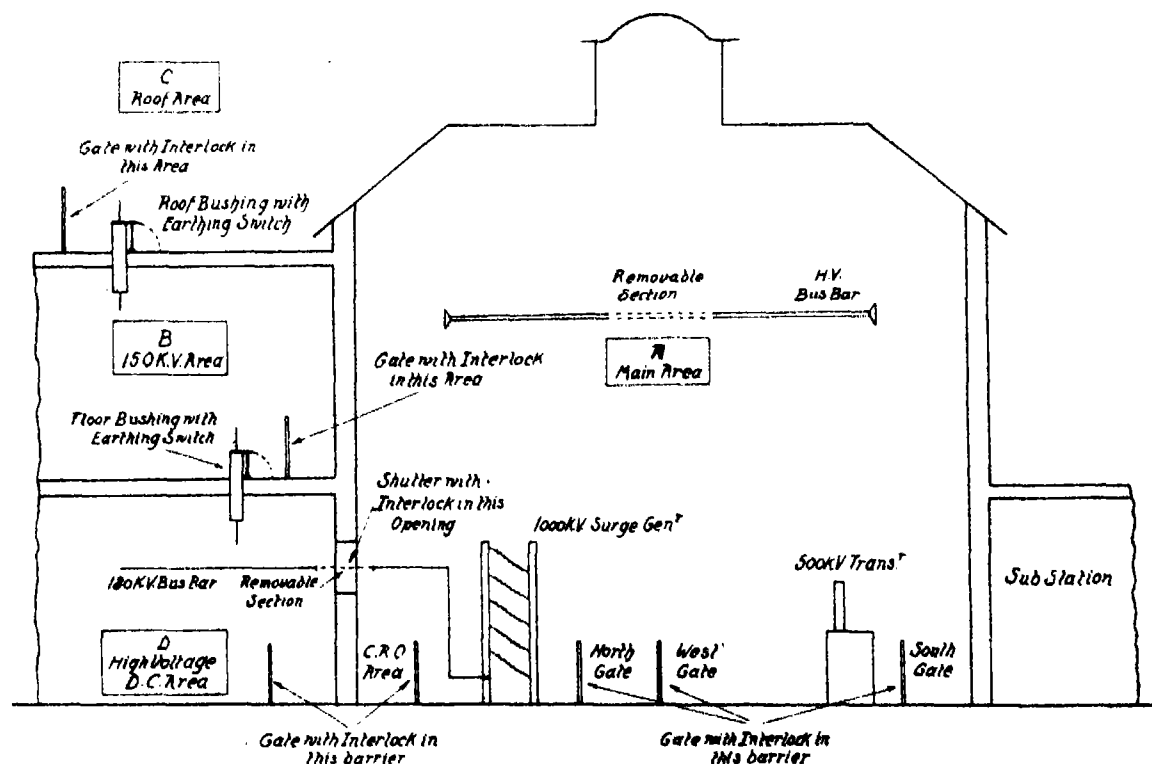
Arrangement of High Voltage Laboratory, Queen Mary College, London.
